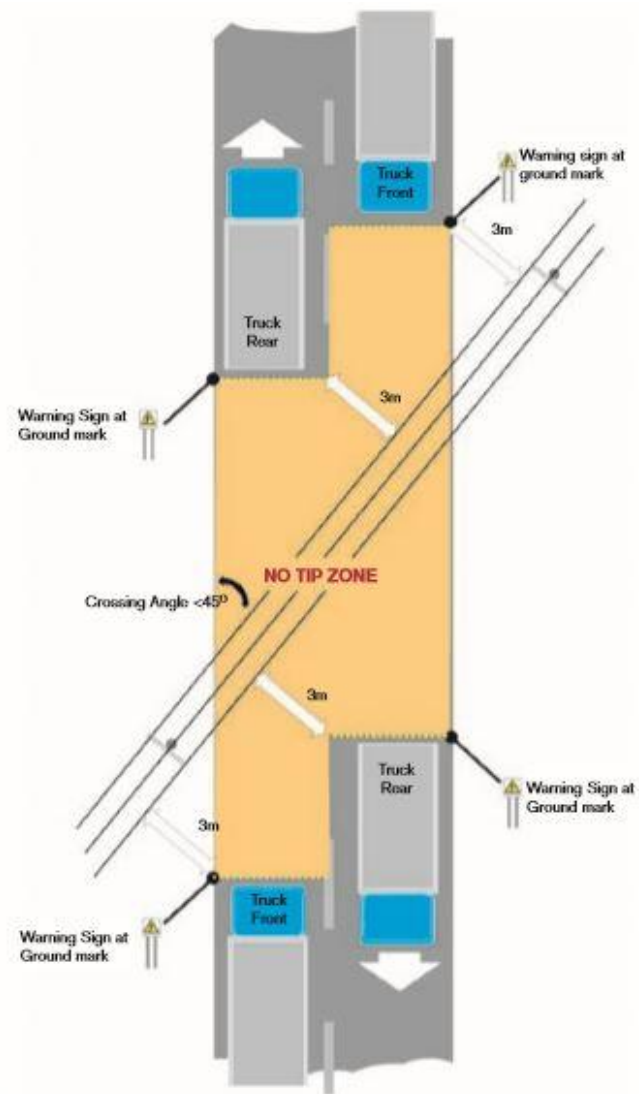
Safe System of Work for road resurfacing only where crossing angle is less than 45 degrees with road
